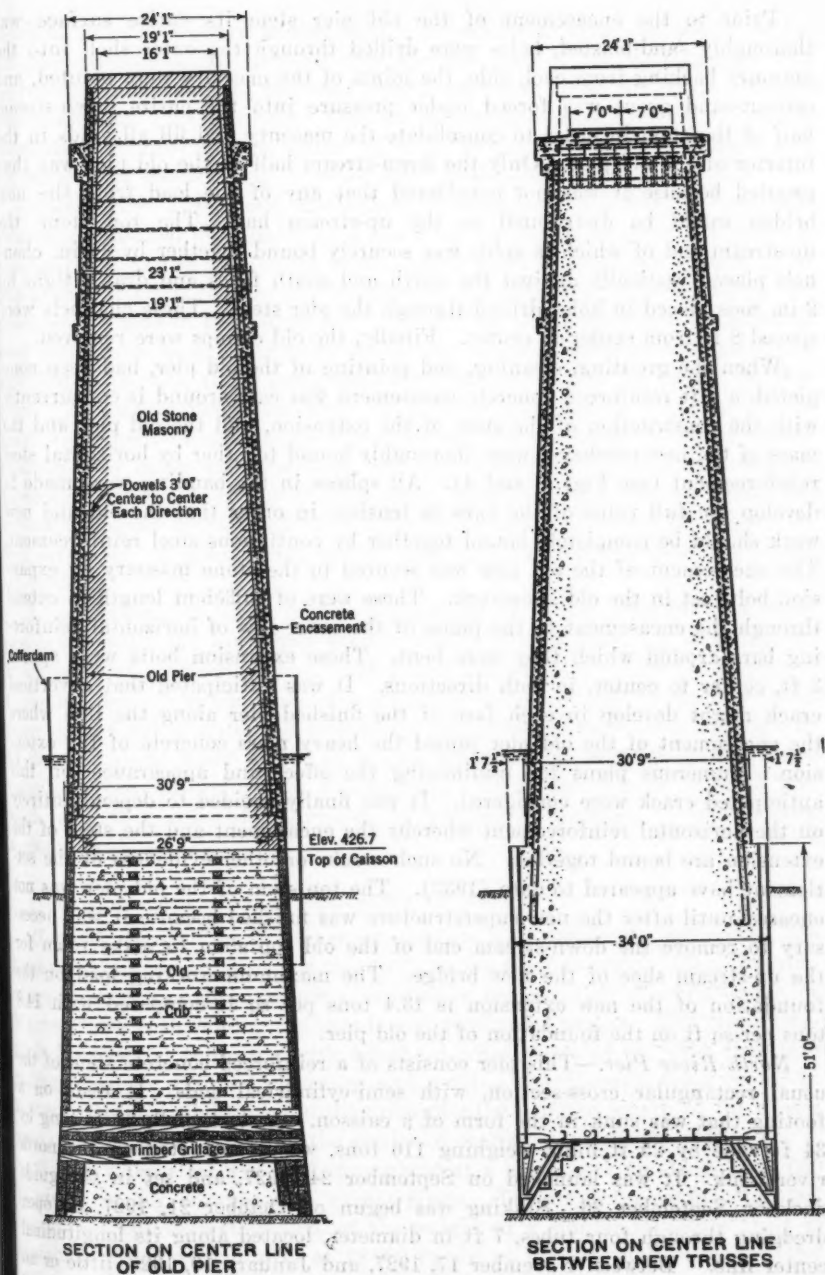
DETAILS OF SOUTH RIVER PIER
